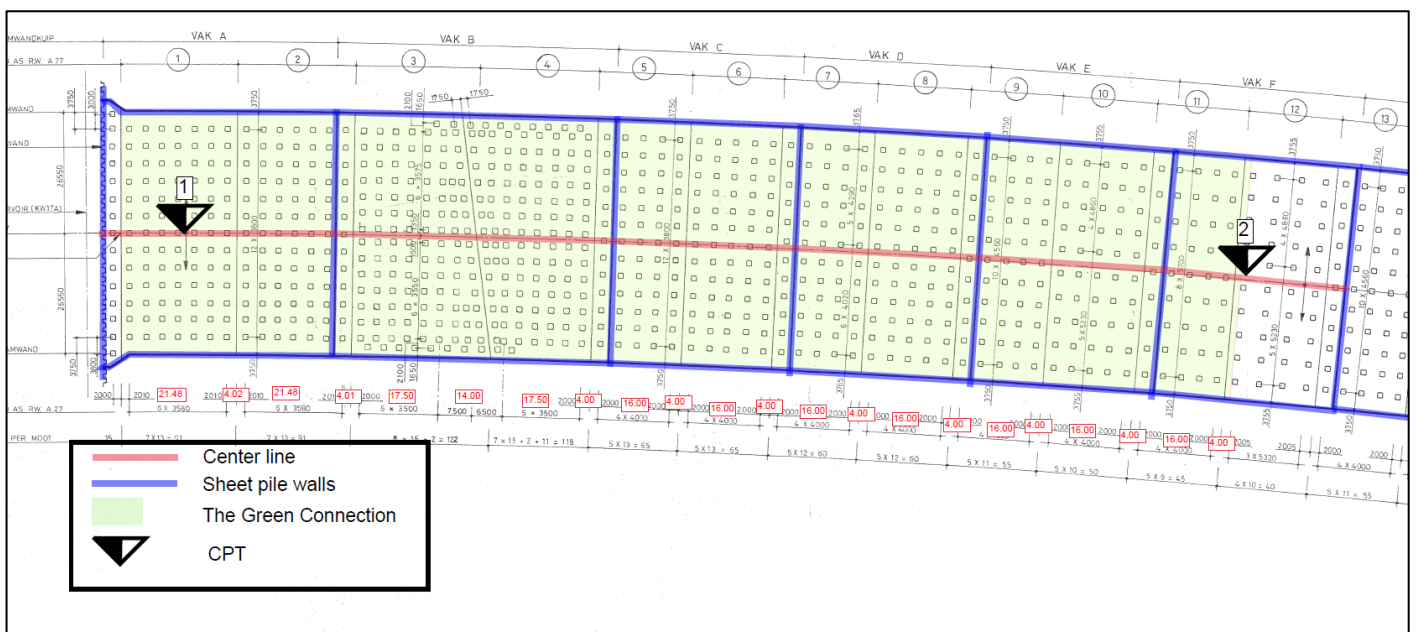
Overview of the existing foundation of the U-shaped concrete structure [5].
